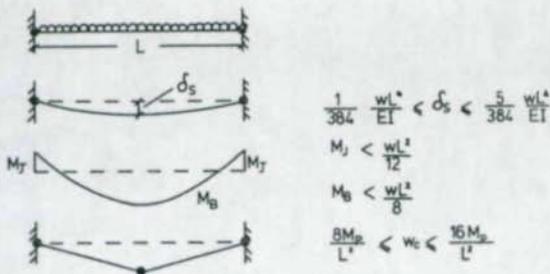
Behaviour of Beam with Semi-rigid/Partial Strength Connections
